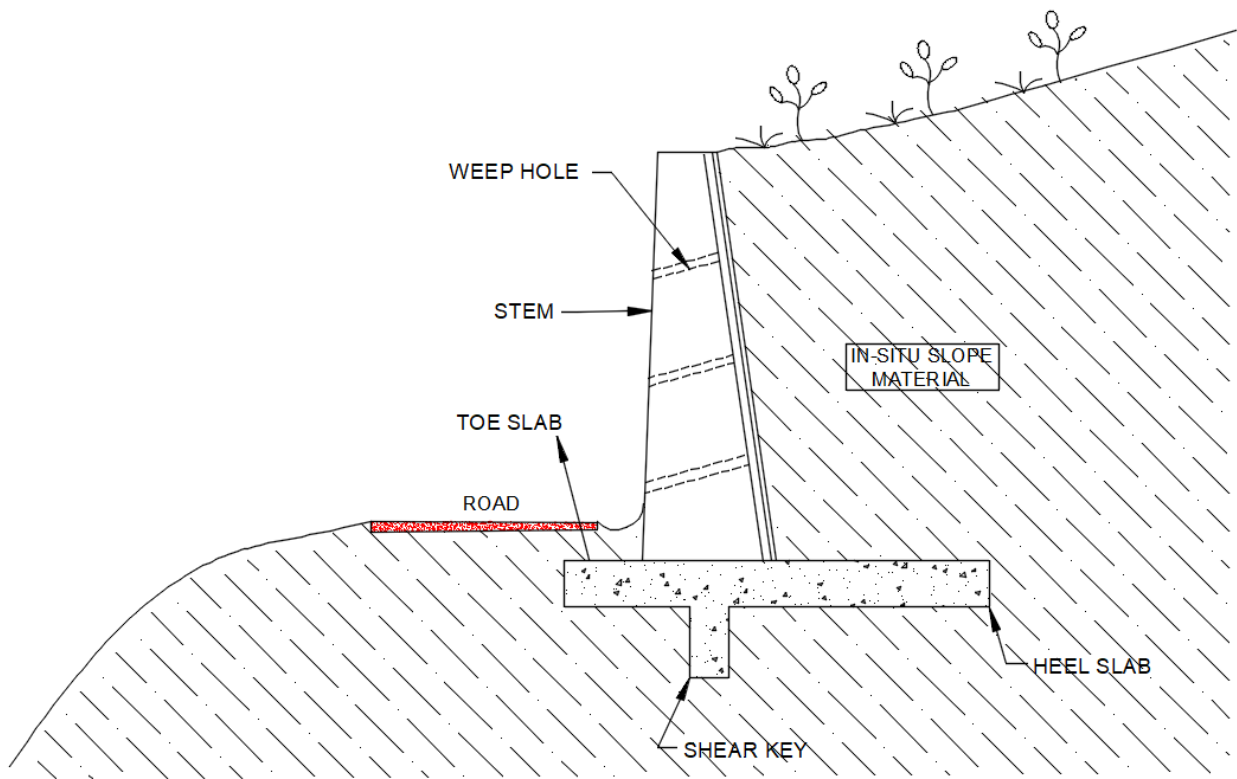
SECTIONAL VIEW OF A CANTILEVER WALL
